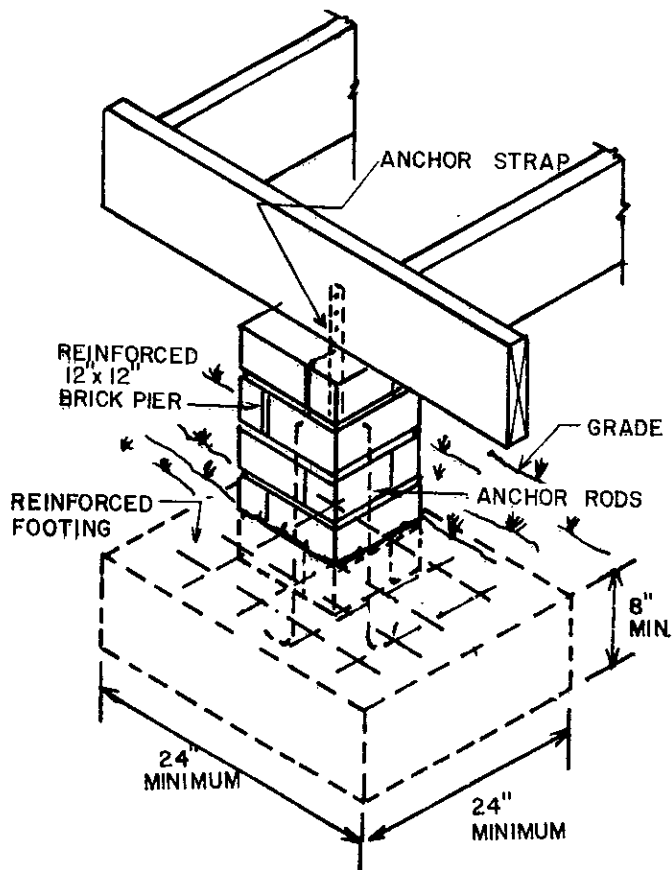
Column tied to footing with reinforcement. (Reference 7)
